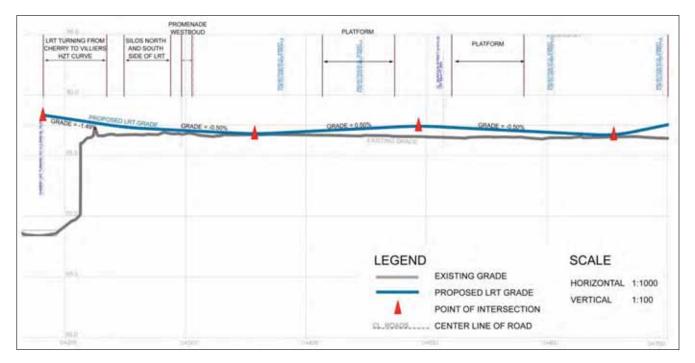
Villiers Street Road Vertical Profile Alternative 1
